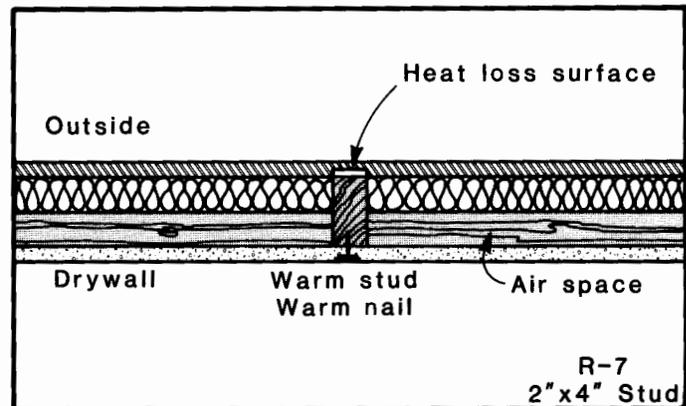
An air space between the insulation and room wall minimizes the thermal bridge.
